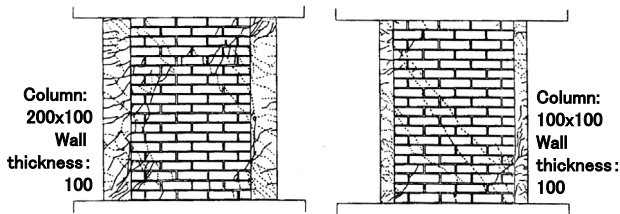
Confined brick masonry walls in the test of Building Research Institute in 1994 [1].
